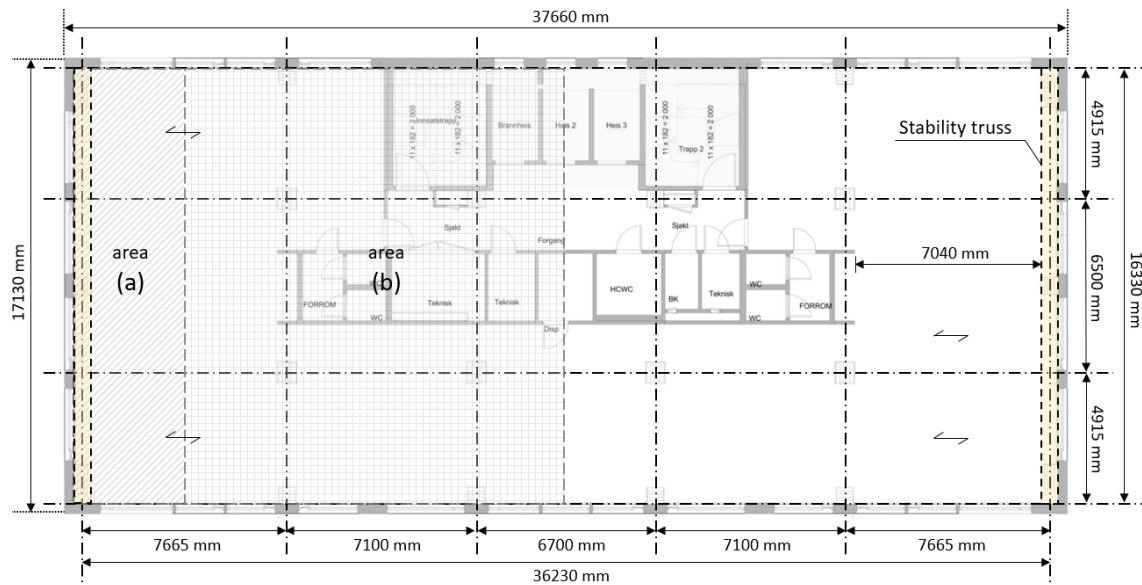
Typical floor plan (office floor) with approximate dimensions. Adapted from [38, id: 44852]
